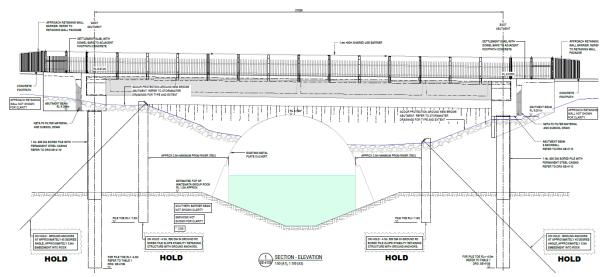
Image of existing culvert with indicative new bridge structure developed the structural team.
